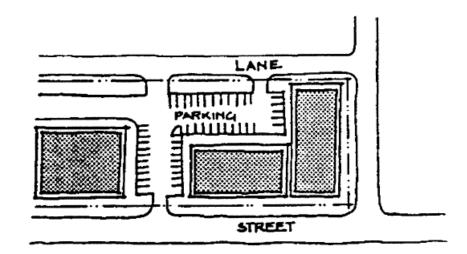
Commercial surface parking should be internalized, at the back or side of buildings.
